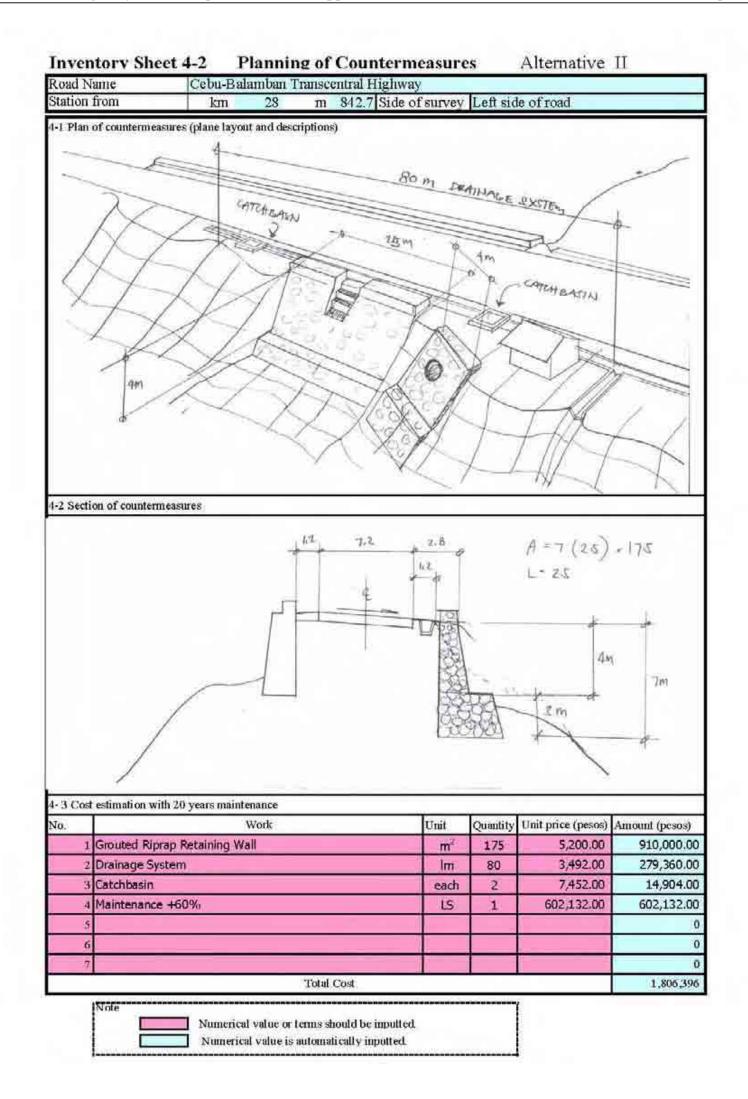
Example of Inventory Sheet 4-2: Planning of Countermeasure Alternative II for Road Slip
